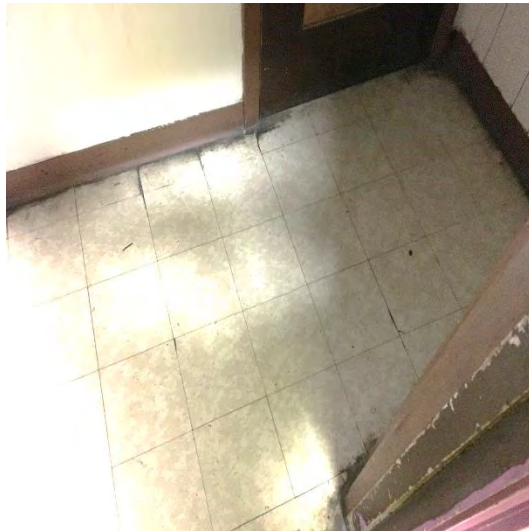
View of non-asbestos floor tile on top of plywood and VAT.
